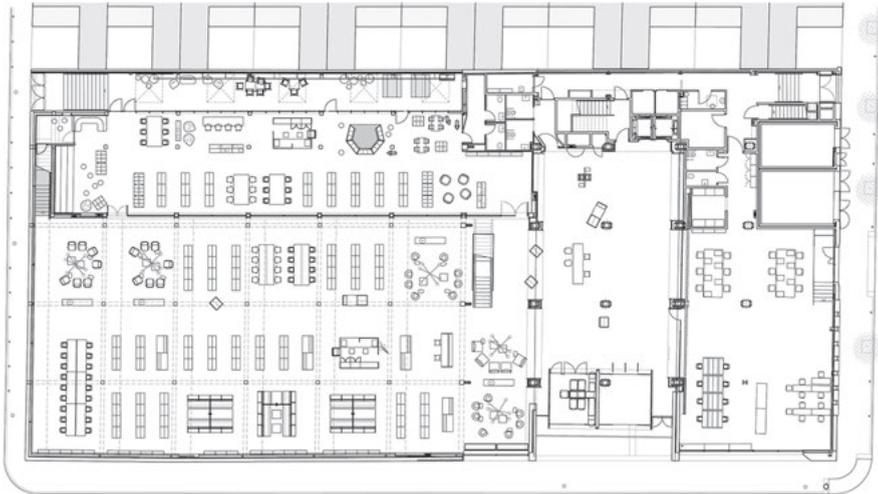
Ground floor plan. © Ricard Mercadé Aurora Fernández arquitectes.
